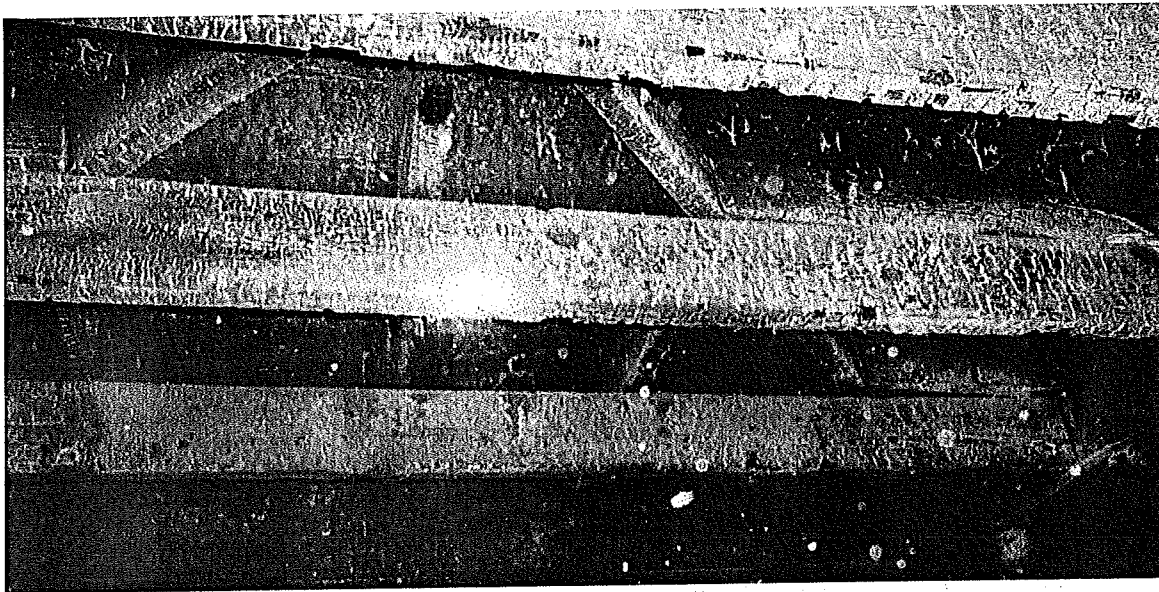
Fire Damaged Trusses and Roof System
